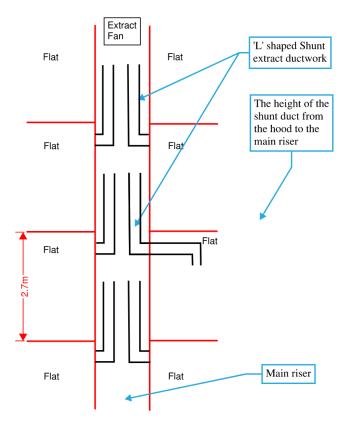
Existing layout of shunt duct system in Cromwell Tower
